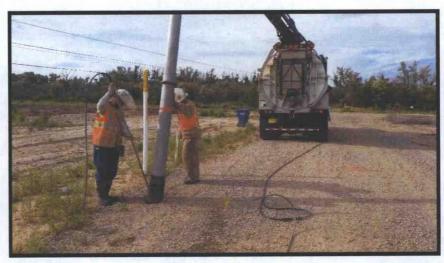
Hydro Excavation of the waterline began early Monday morning.
